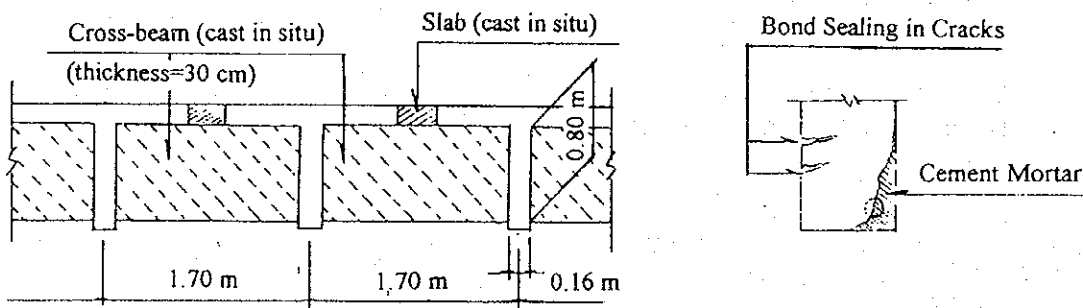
Applying Cross Beam & Reforming Beam
